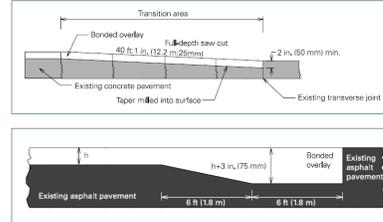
Mill and fill transition for concrete overlay of concrete pavement (adapted from ACPA 1998)
